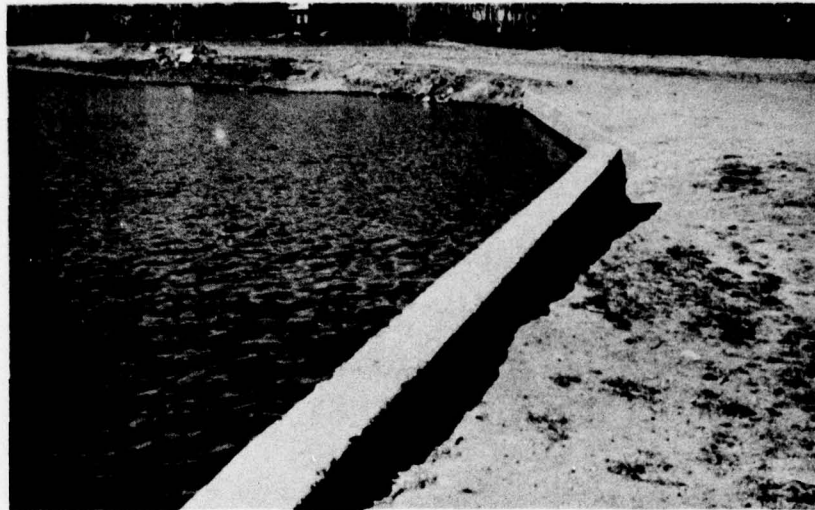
View of left abutment upstream wingwall topped on November 8, 1977. The upstream shore of White's Pond can also be seen
